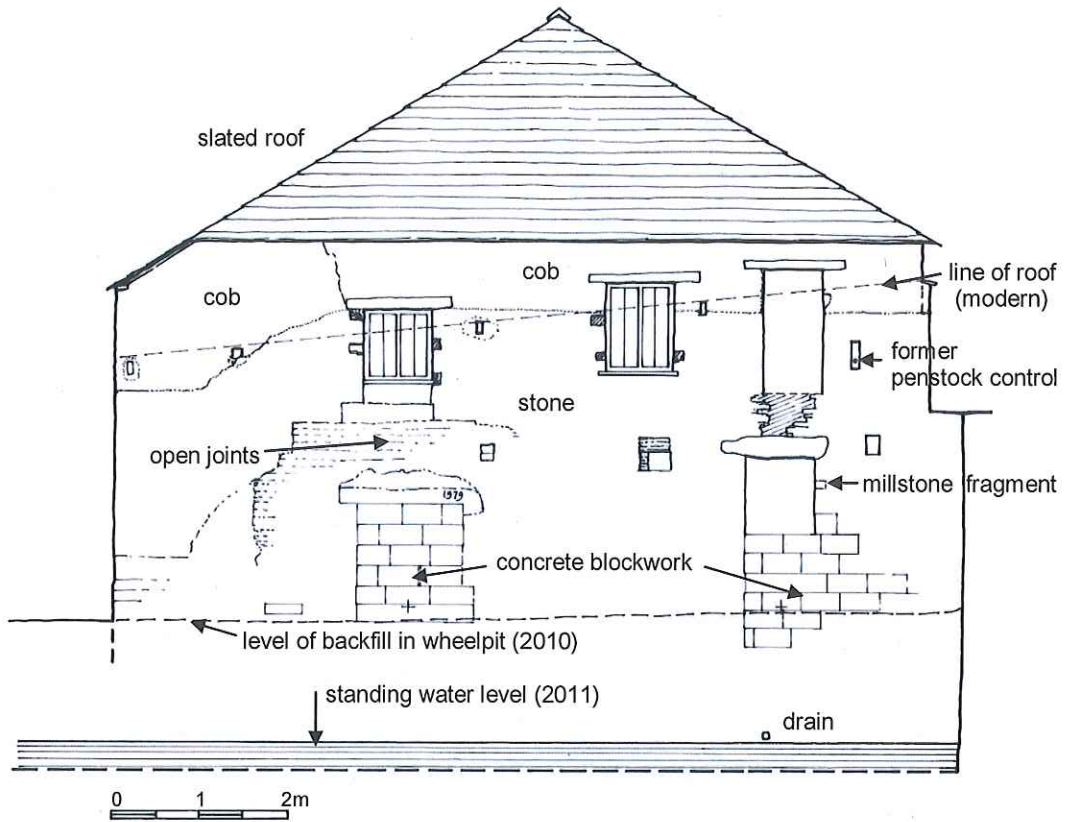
Lew Mill. West elevation of mill – wheelpit wall
